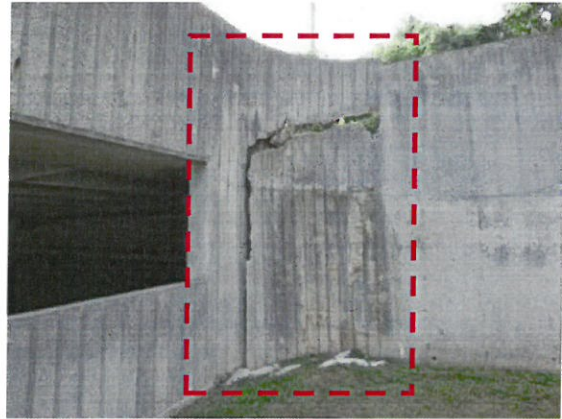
Severely cracked and distressed retaining wall on Parking Structure B
